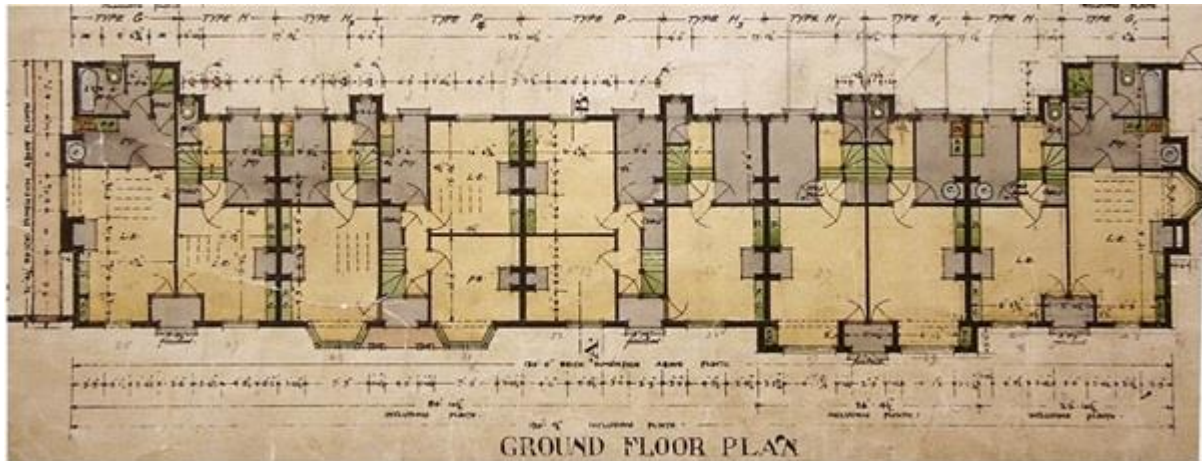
Example ground floor plan. (LMA ref: LCC/AR/HS/03/035)
